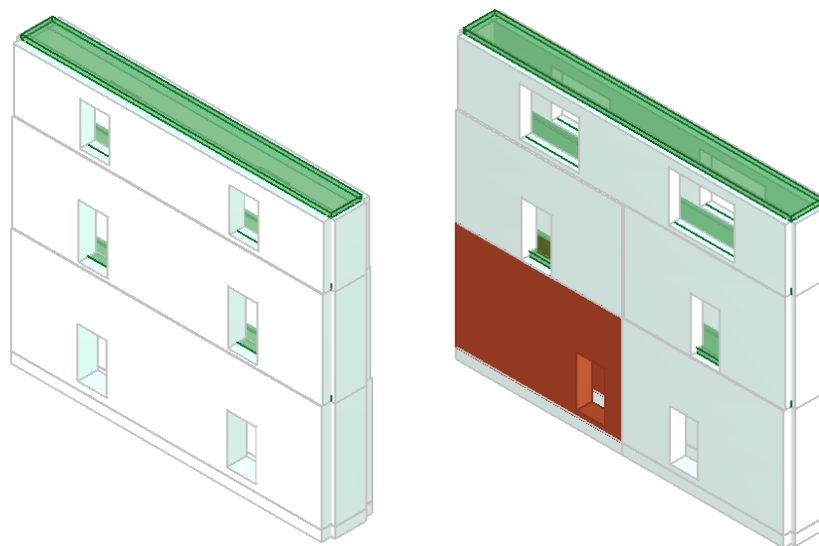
Numerical model of the equivalent structure used to analyse wall 8 (left) and wall 11 (right).
